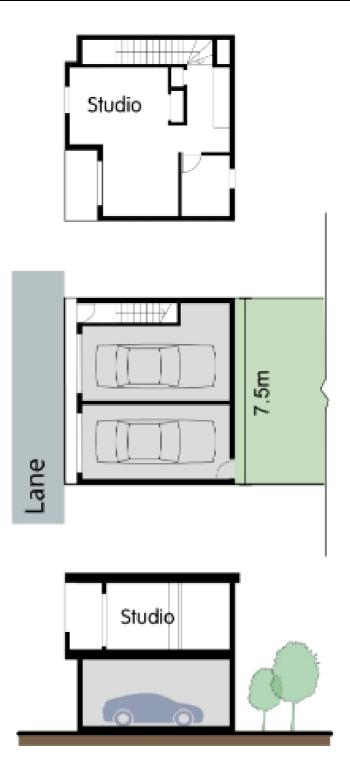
Typical Studio Dwelling Typology with One Parking for Terrace and One Parking for Studio
